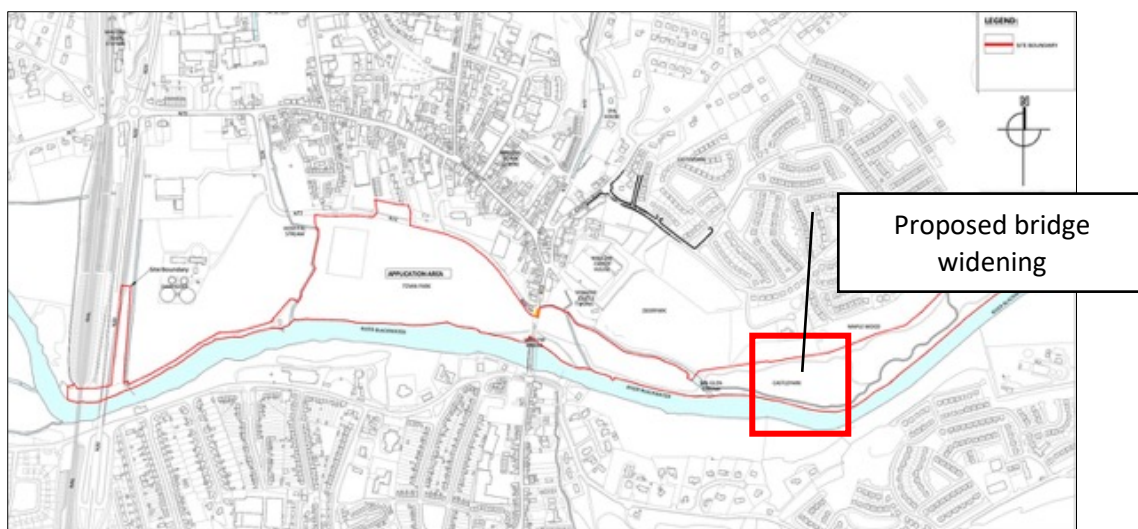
Location of Proposed Bridge Widening Drawing | Source Brady Shipman Martin
